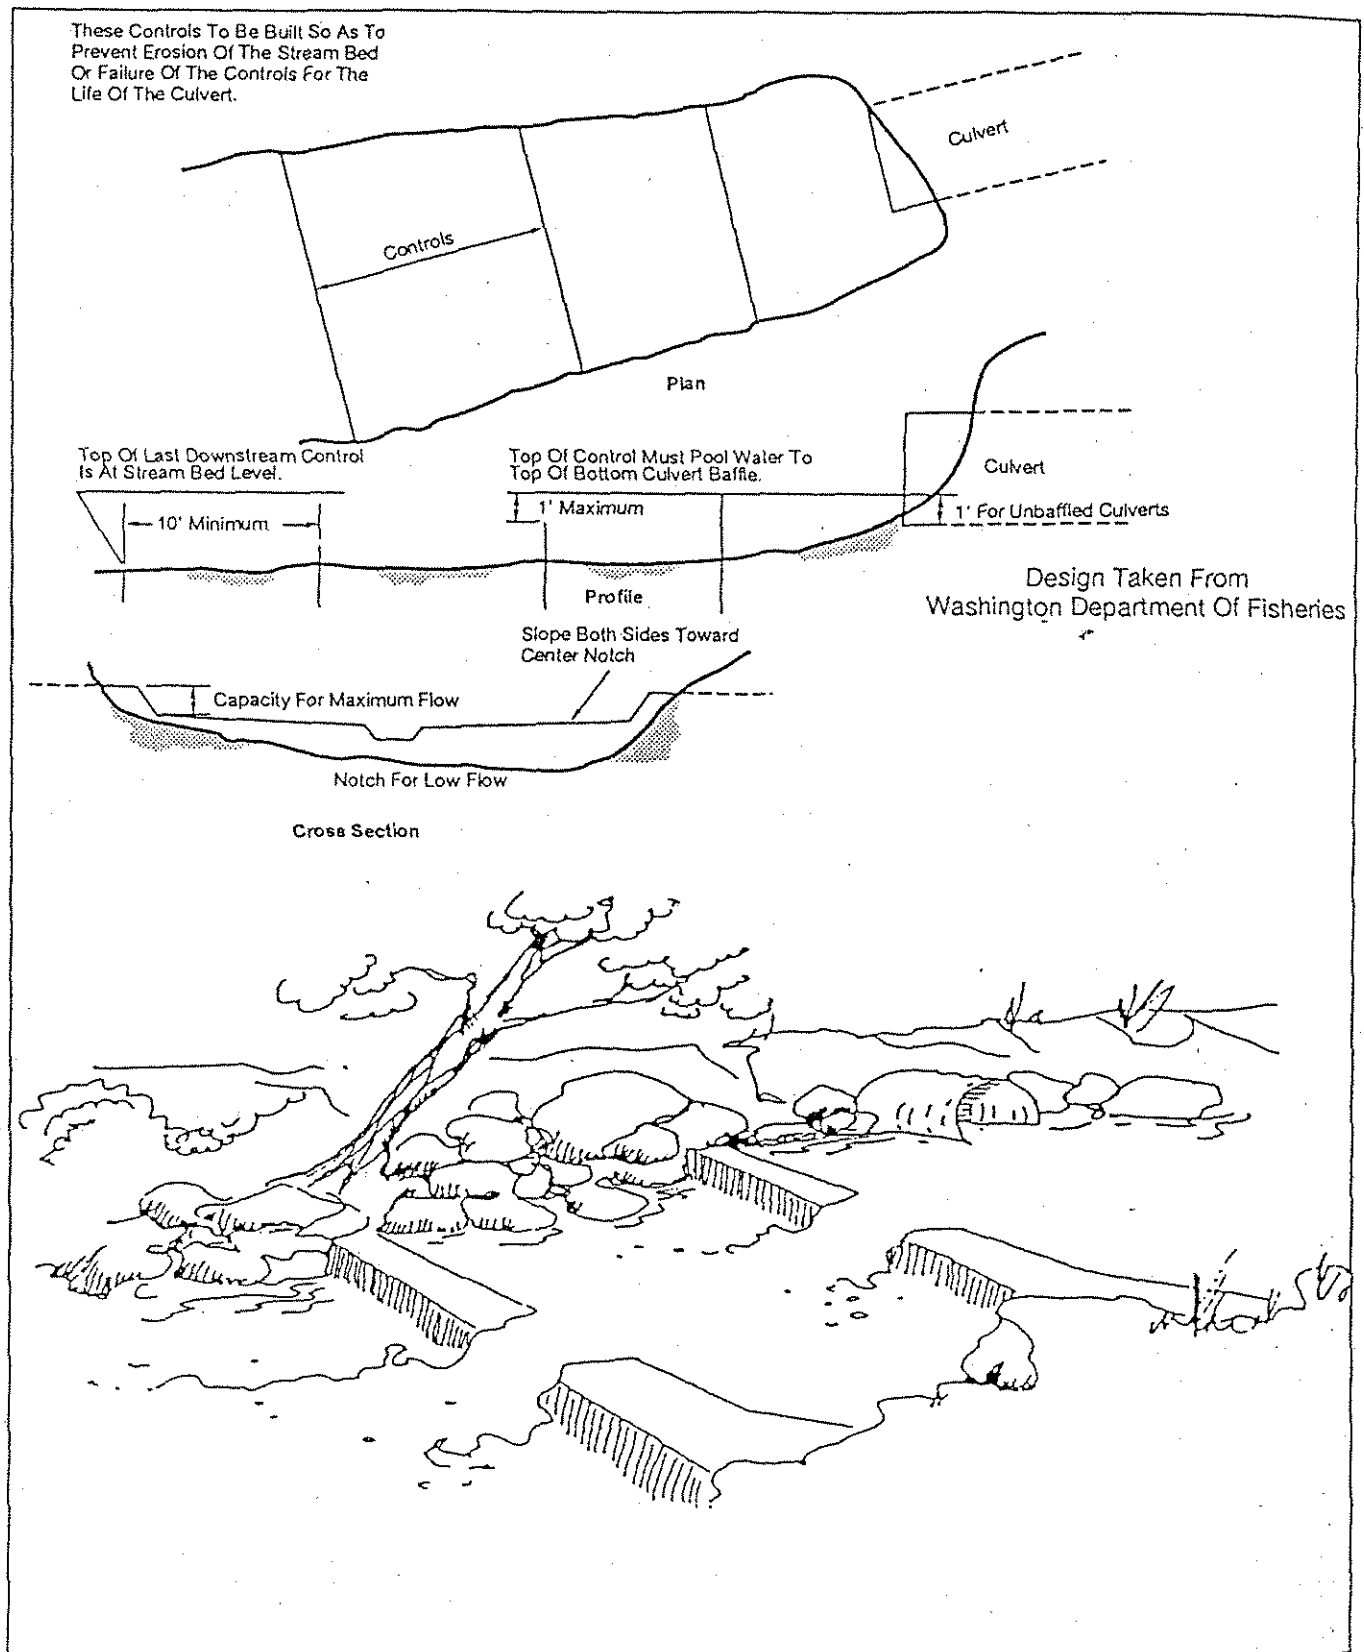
Gabion or concrete sills can raise tailwater elevations to facilitate fish entry into culverts. Evans and Johnston, 1980.
